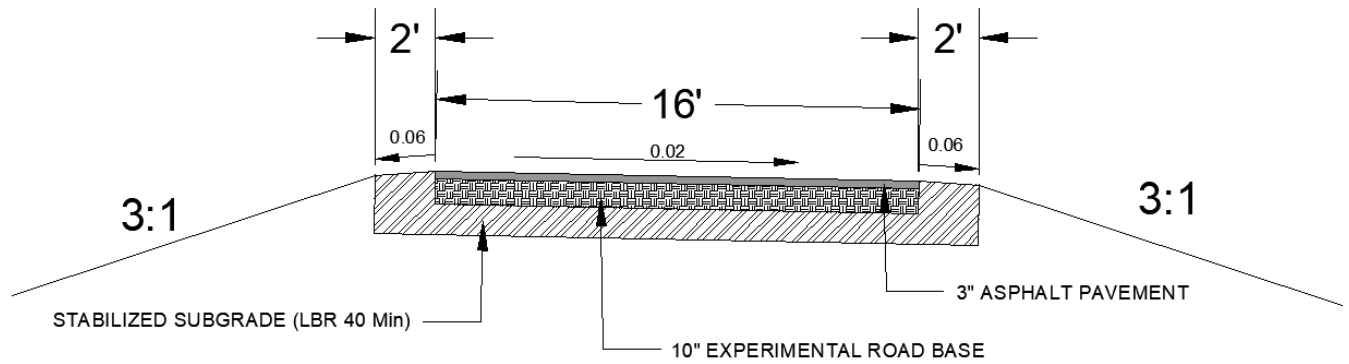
Cross section of the proposed demonstration road including 2-foot wide shoulders, the 3-inch deep asphalt pavement, 10-inch deep experimental road base, and stabilized subgrade.
